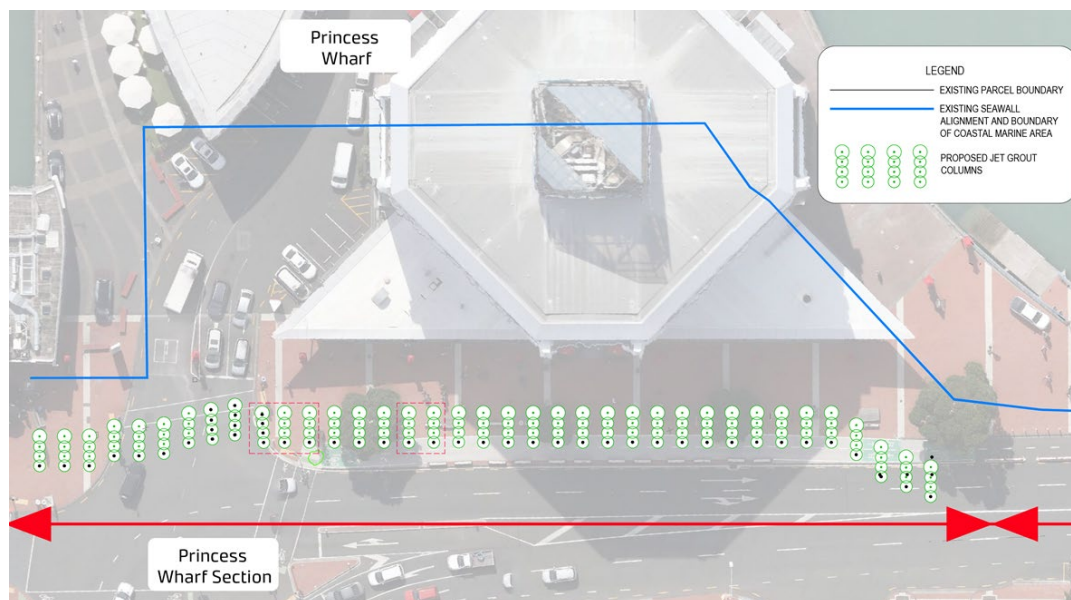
Jet grout column configuration for the shear wall constructed in the Princes Wharf section.
